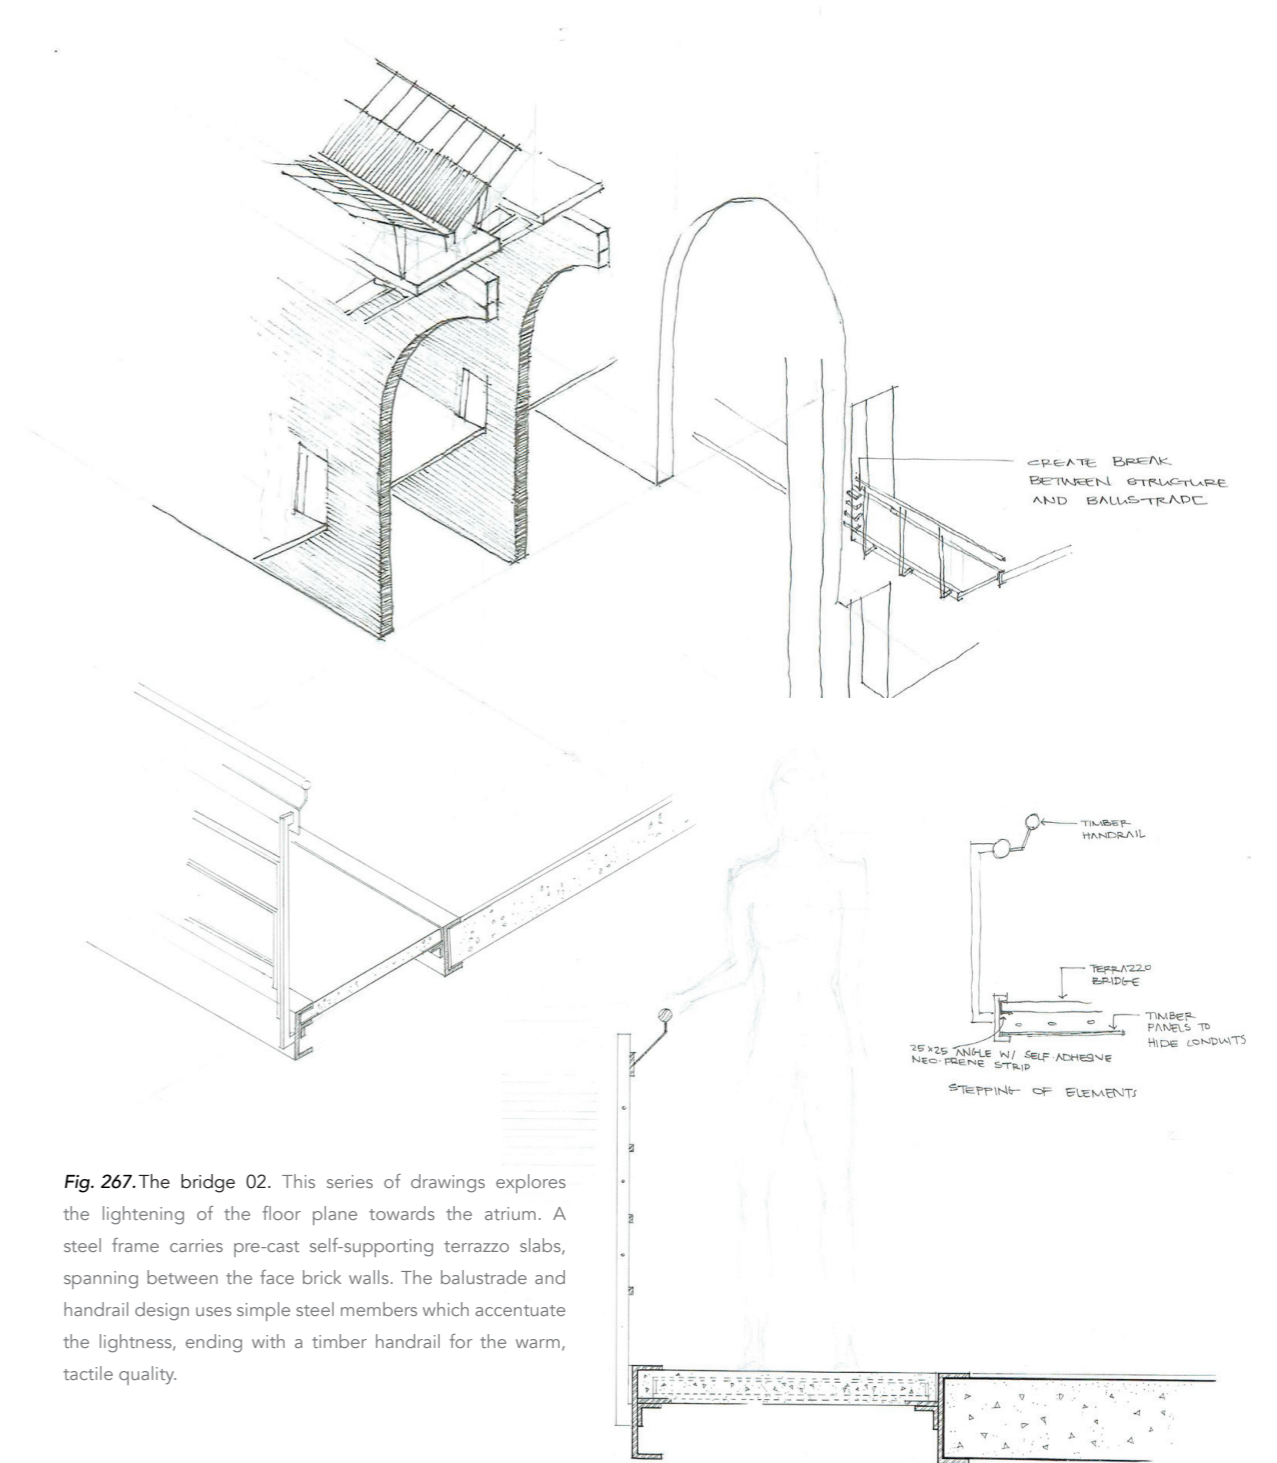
The bridge O2. This series of drawings explores the lightening of the floor plane towards the atrium. A steel frame carries pre-cast self-supporting terrazzo slabs, spanning between the face brick walls. The balustrade and handrail design uses simple steel members which accentuate the lightness, ending with a timber handrail for the warm, tactile quality.
